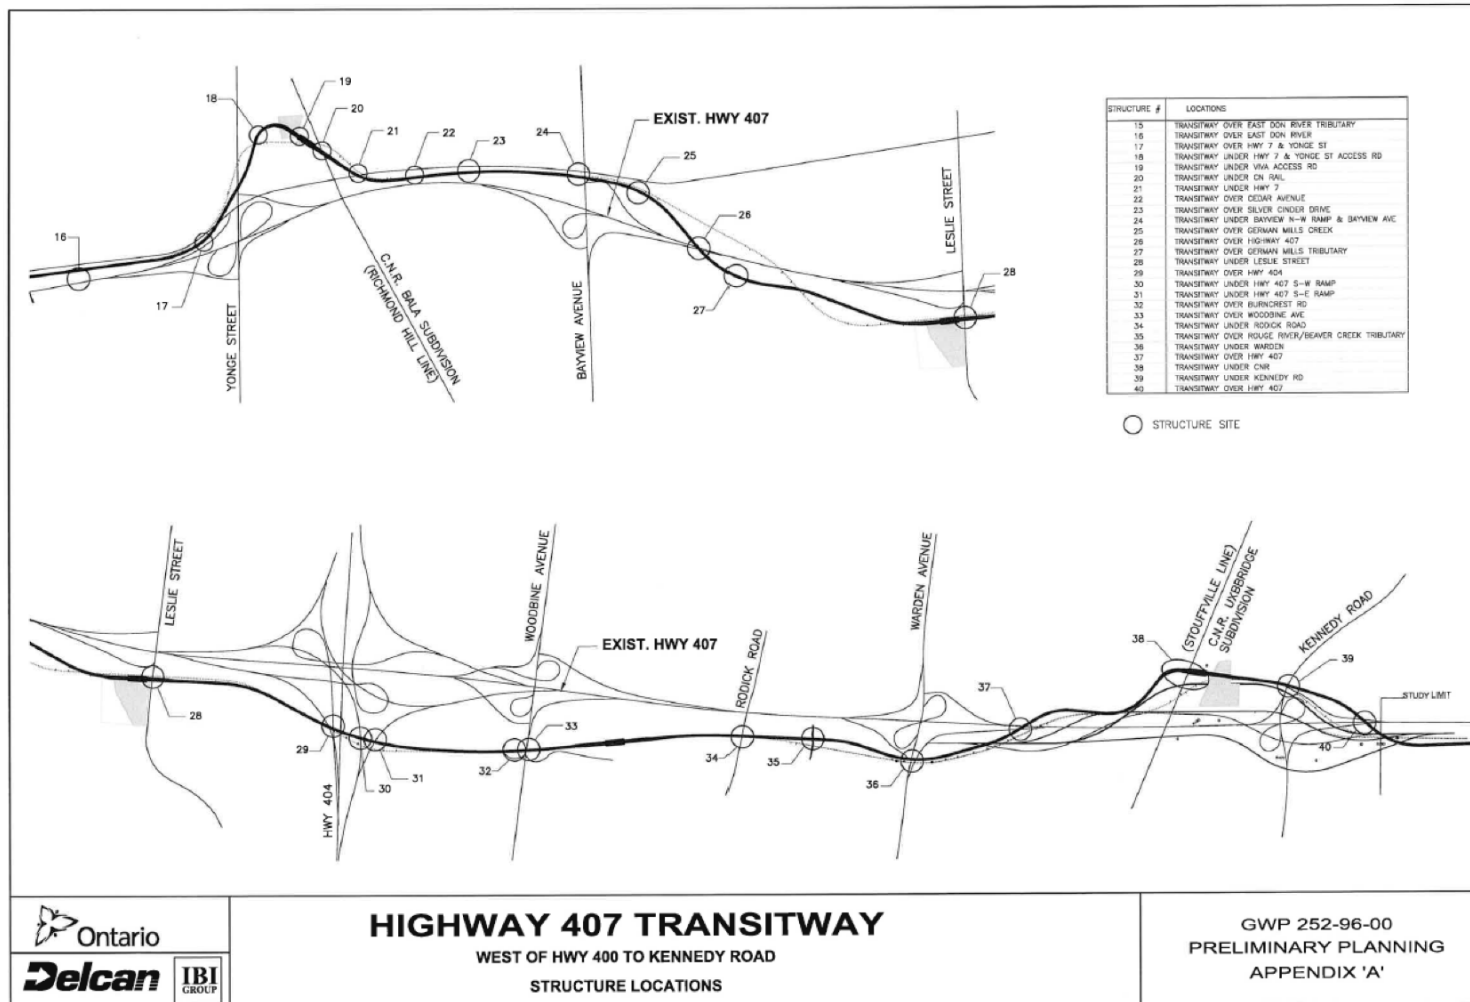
Proposed route 407 LRT and structure location base on 60% drawings from Leslie Street to Kennedy Road [Delcan, IBI Group, March 2010].
